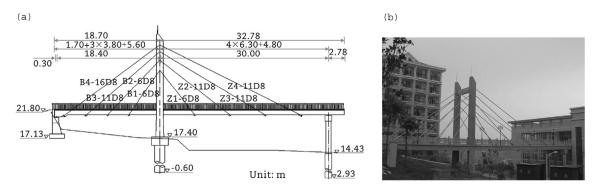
First cable-stayed bridge in China. (a) Overall layout. (b) Appearance of the bridge.
